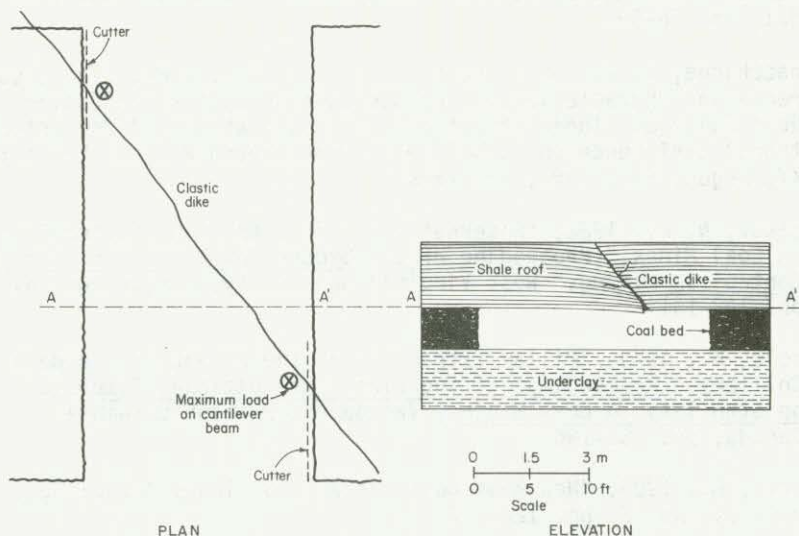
Roof deflection at clastic dike due to weight of cantilever beam as would be expected from figure 12.
